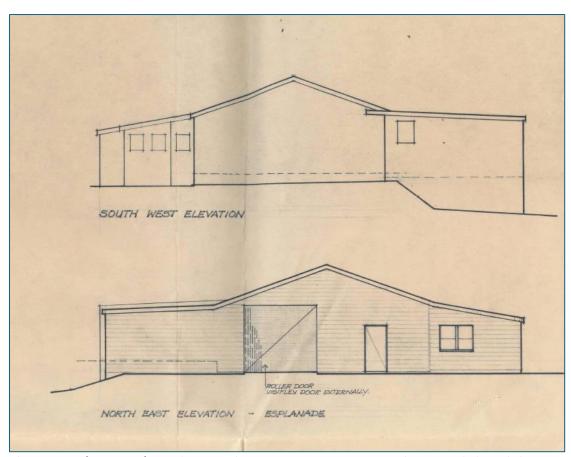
Front (North east) elevation according to approved plans for renovation to an existing building - processing plant 1983
